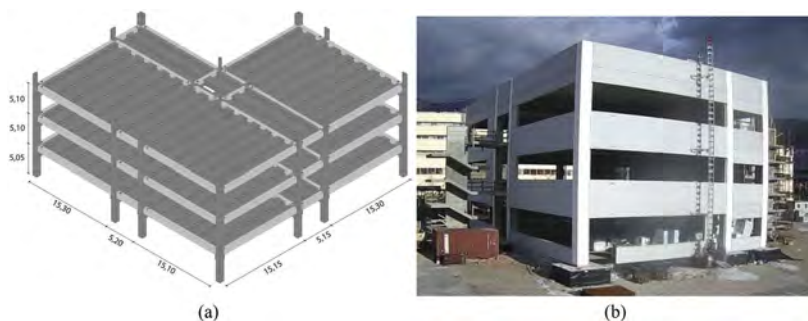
Structure at study: (a) axonometric view with main structural elements and geometry; (b) picture of the building near completion.
